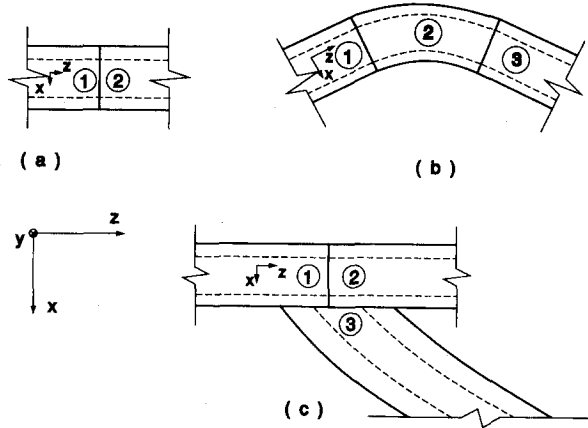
Typical intersection of box girder bridge assemblages in plan.
